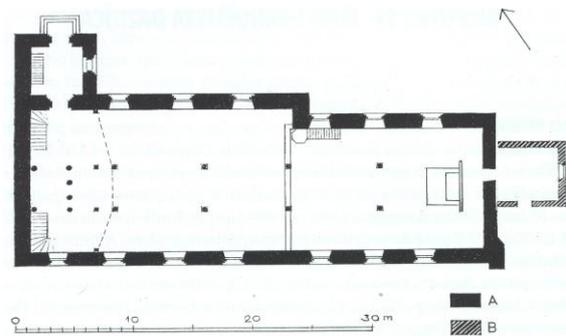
Architect Elfrīda Pluka. Plan of St. John the Evangelist's Church (around 1290) in Hasenpot: A – walls of the Middle Ages, B – sacristy built in 1860. 1951 [11, 74].
